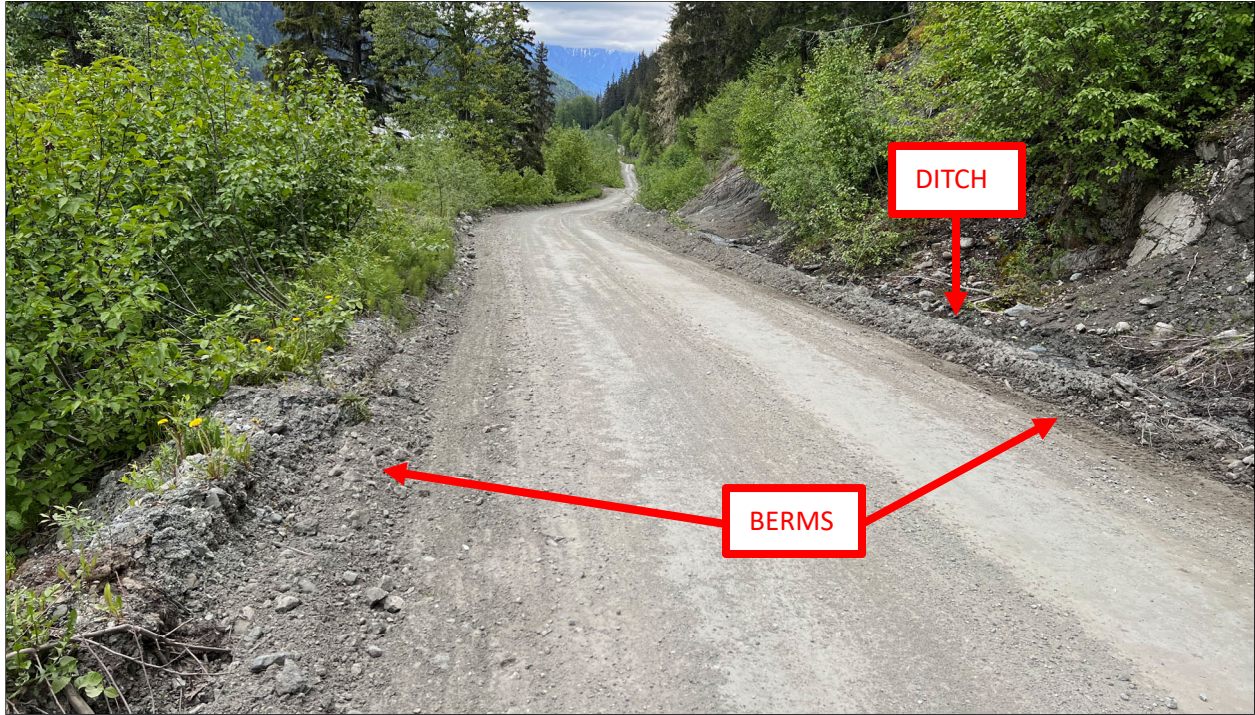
A typical location on Porcupine Trail Road showing vegetation encroachment on roadway shoulders and existing berms (the result of blading/grading maintenance) preventing drainage of storm water off roadway and/or to adjoining ditches, taken 6/7/2023 prior to Applicant's Phase 1 work. Source – Garret Gladsjo, proHNS.
